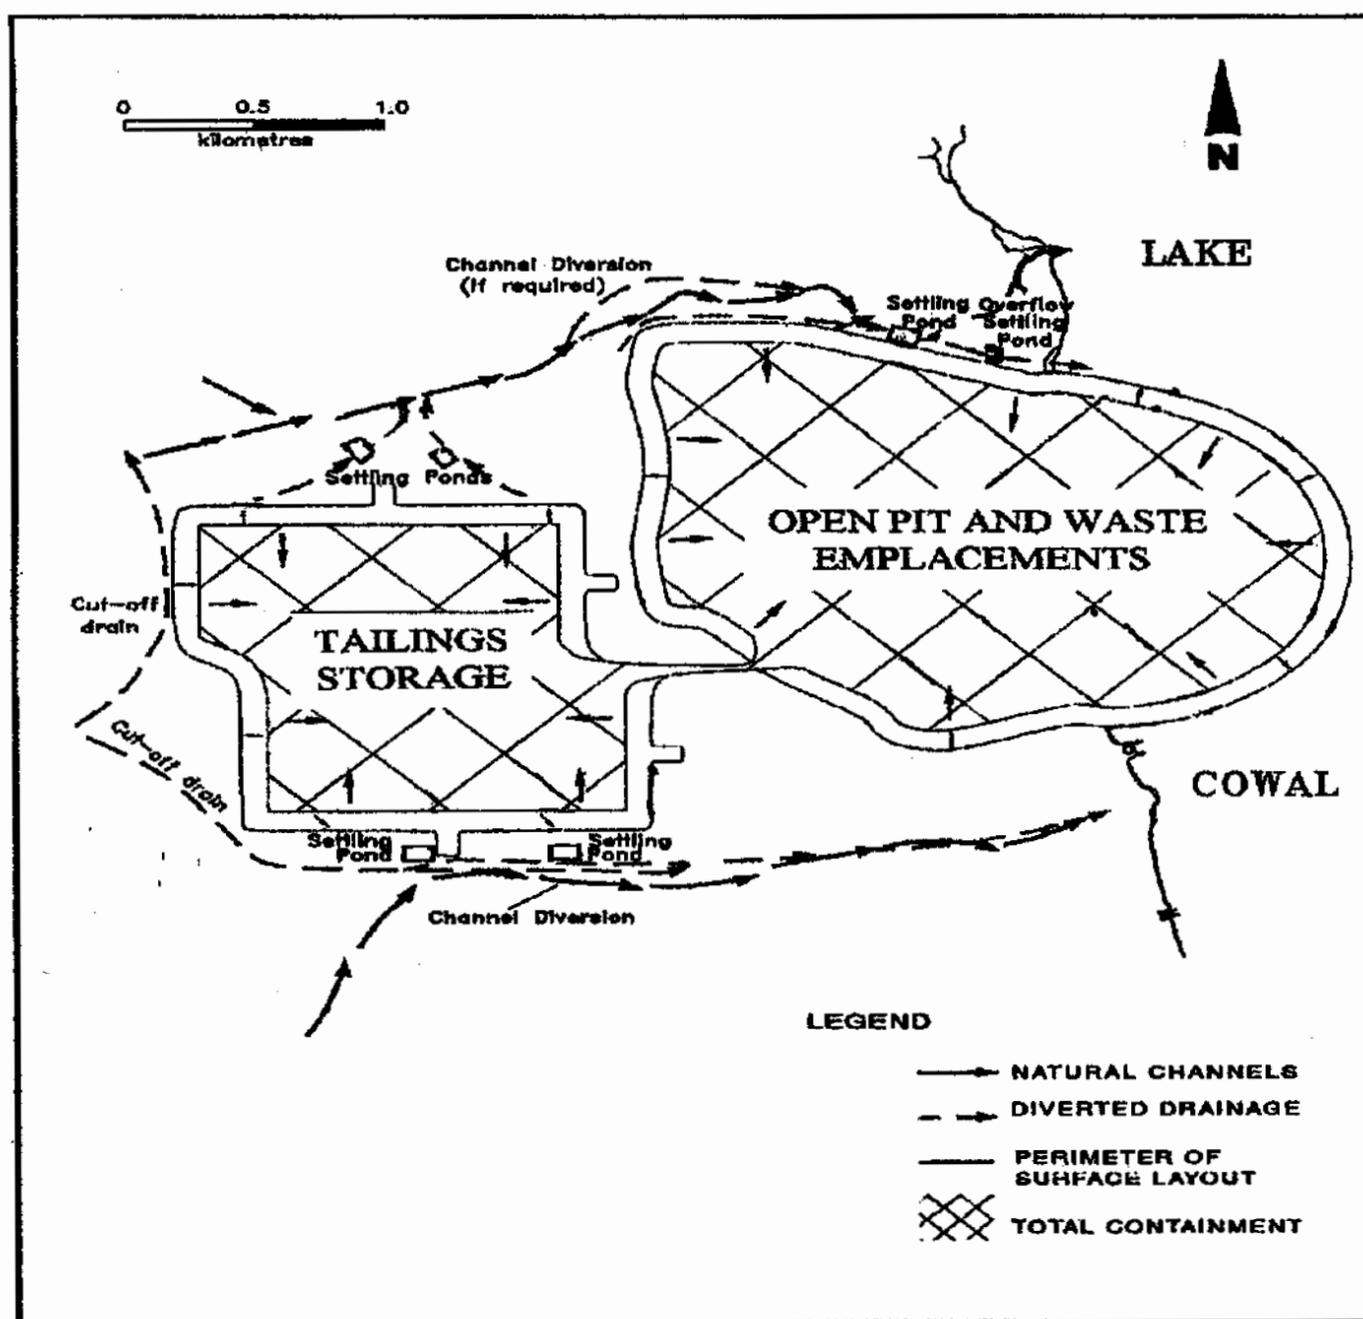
Mine site layout, drainage and water management plan (after NSR, 1996)
